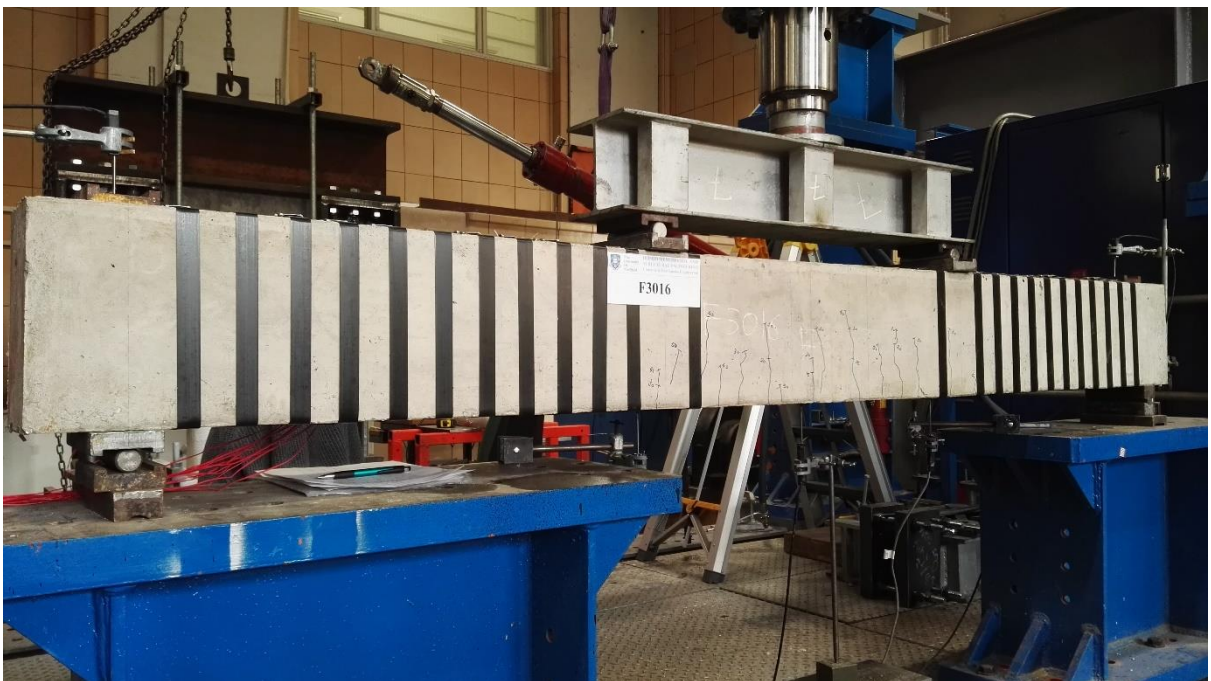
Testing and metal straps arrangements for all beams reinforced with 16-mm rebars.
